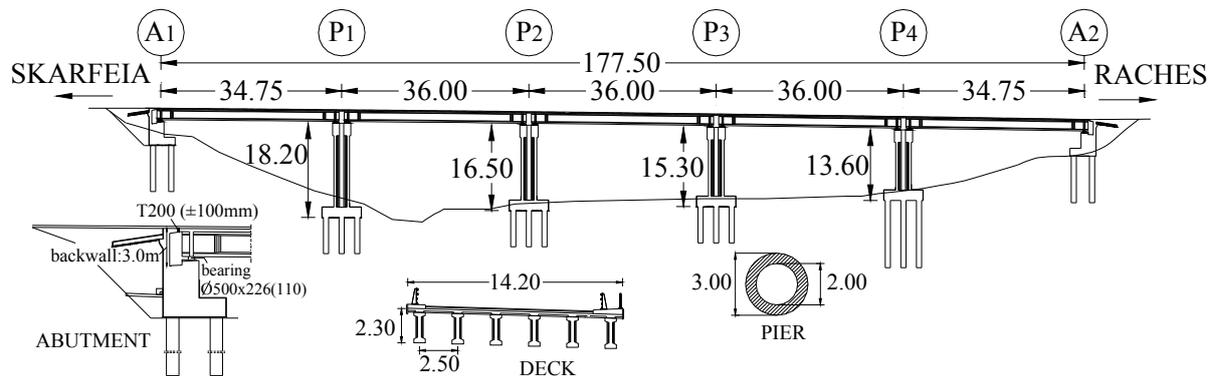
Longitudinal section of Scarfeia-Raches bridge and the cross sections of the abutment, the deck at the mid-span and the pier.
